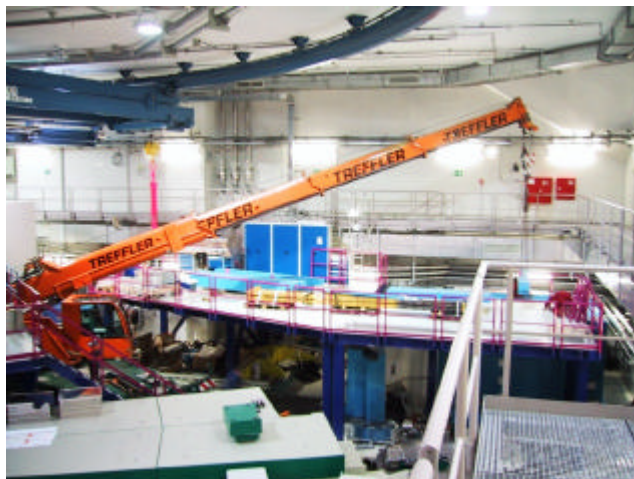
Mounting the blockhouse roof elements with a truck-mounted crane
